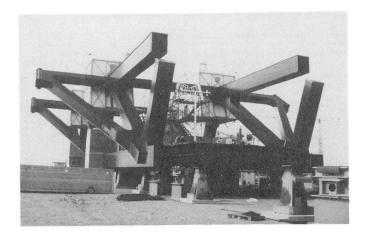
Truss element for the cable-stayed portion of the Øresund Bridge
